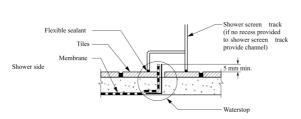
TYPICAL HOBLES CONSTRUCTION
